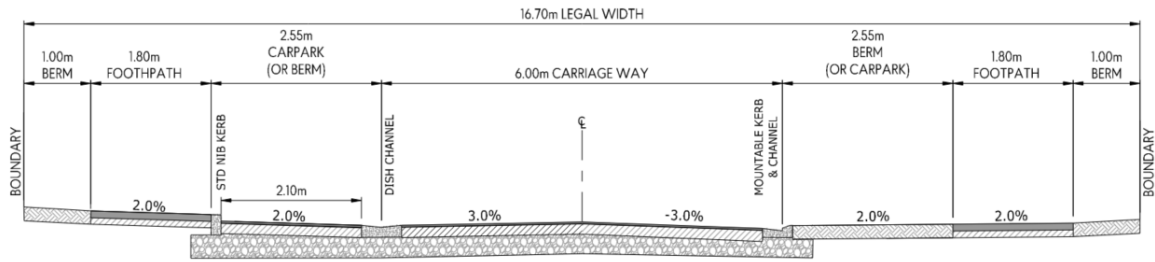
Typical Cross-Section (F) Local Road - 16.7m with Carpark and Berm
